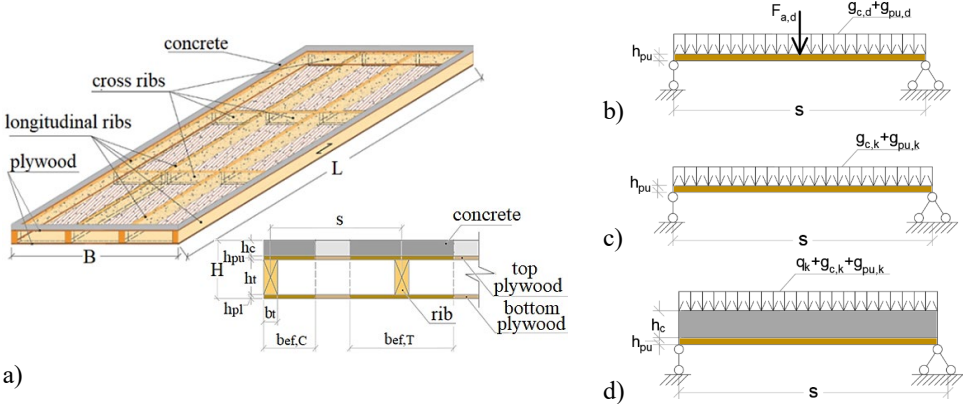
Plywood-concrete slab a) C-type and double-T type cross-sections; b)–d) design schemes,
